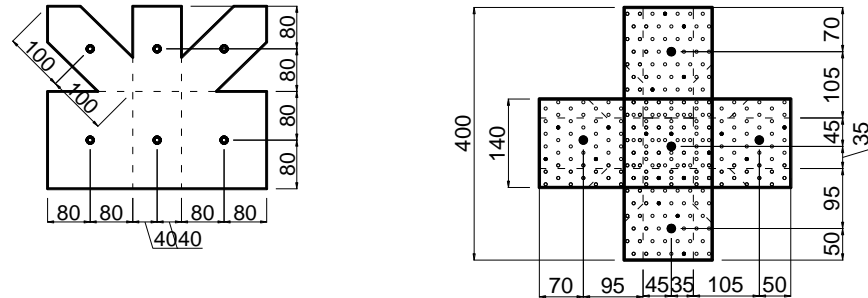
Retrofitting configuration for timber frame walls: (a) with bracings connected (dimensions in cm); (b) without bracings connected (dimensions in cm).
